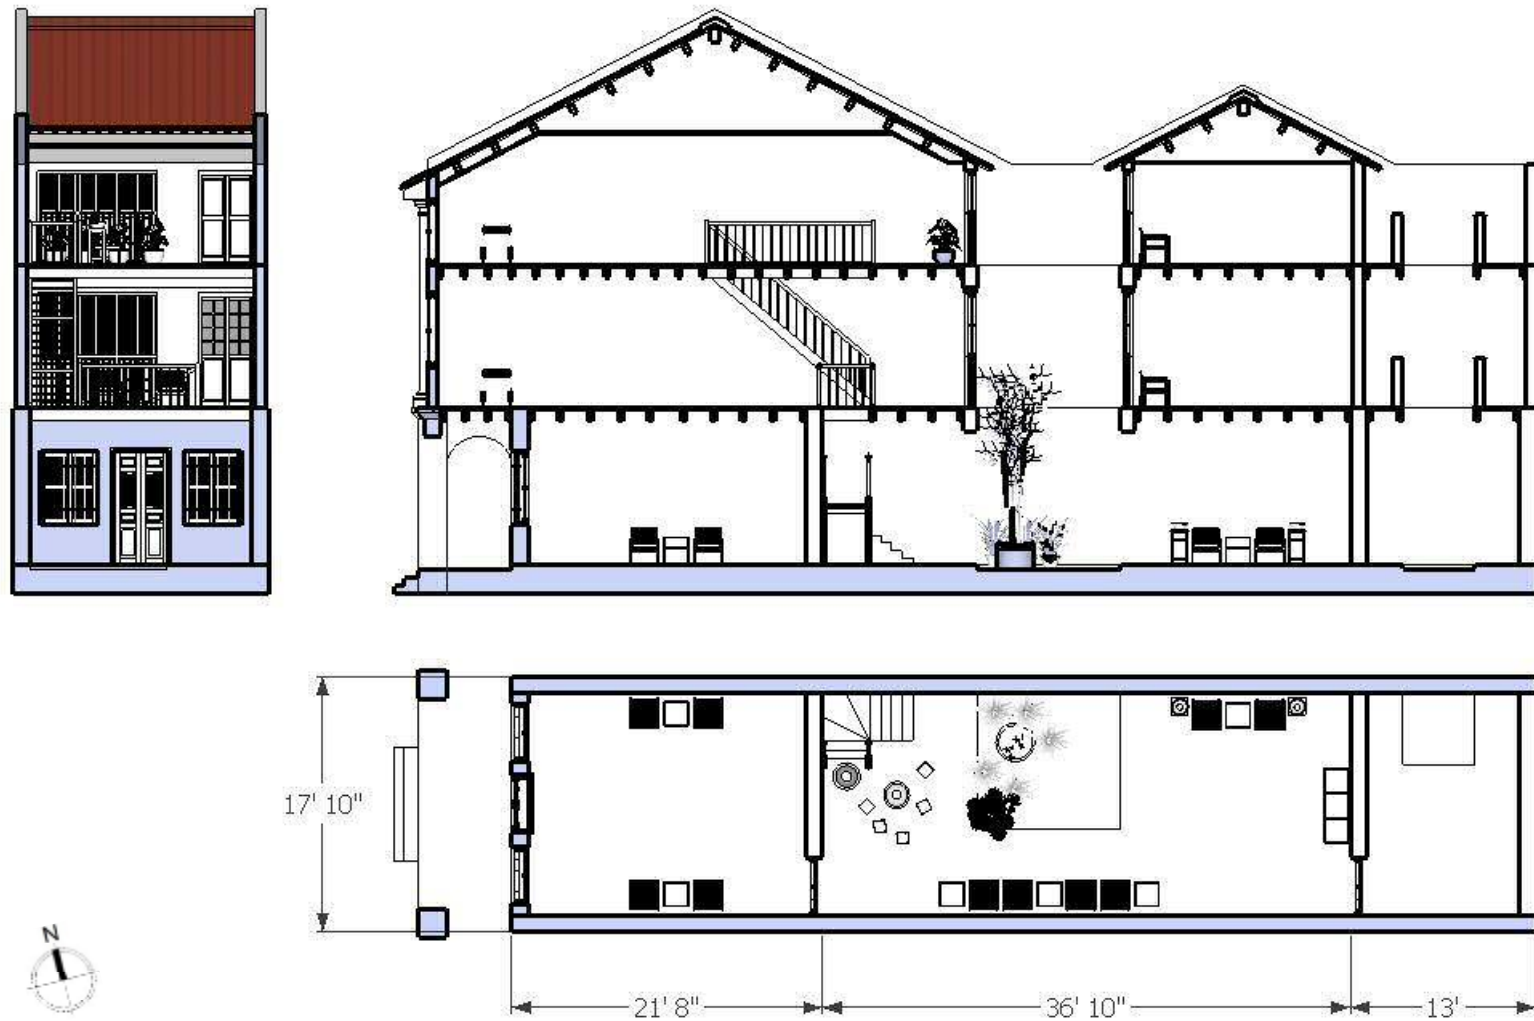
C: General plans of three-storey shophouse at Chinatown in Singapore. (Not to scale drawings)
